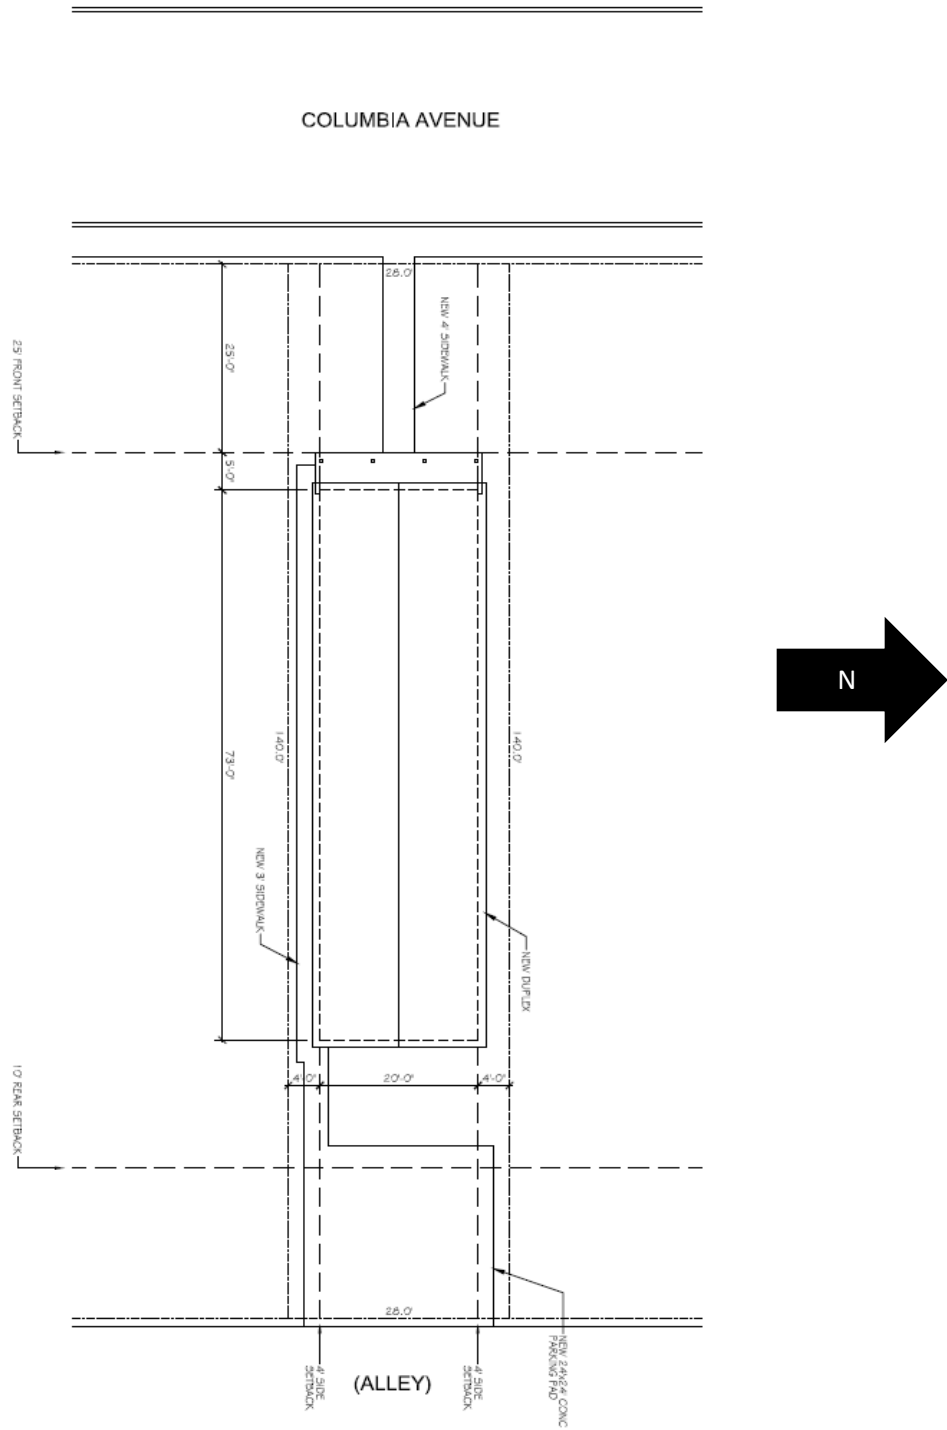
Site plan of the proposed duplex that will be built at 2511 Columbia Avenue.
